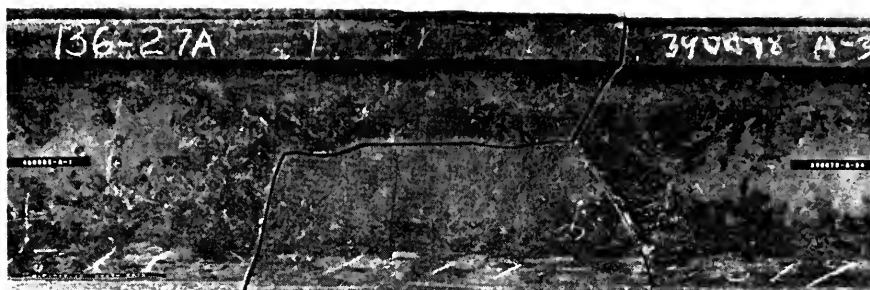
(Investigation 136-27, Sample A)—Side view of a failed electric flash butt welded rail joint. This fracture started at the weld and progressed in a horizontal plane along the neutral axis, then veered toward the base in the east rail and toward the head and base in the west rail.
